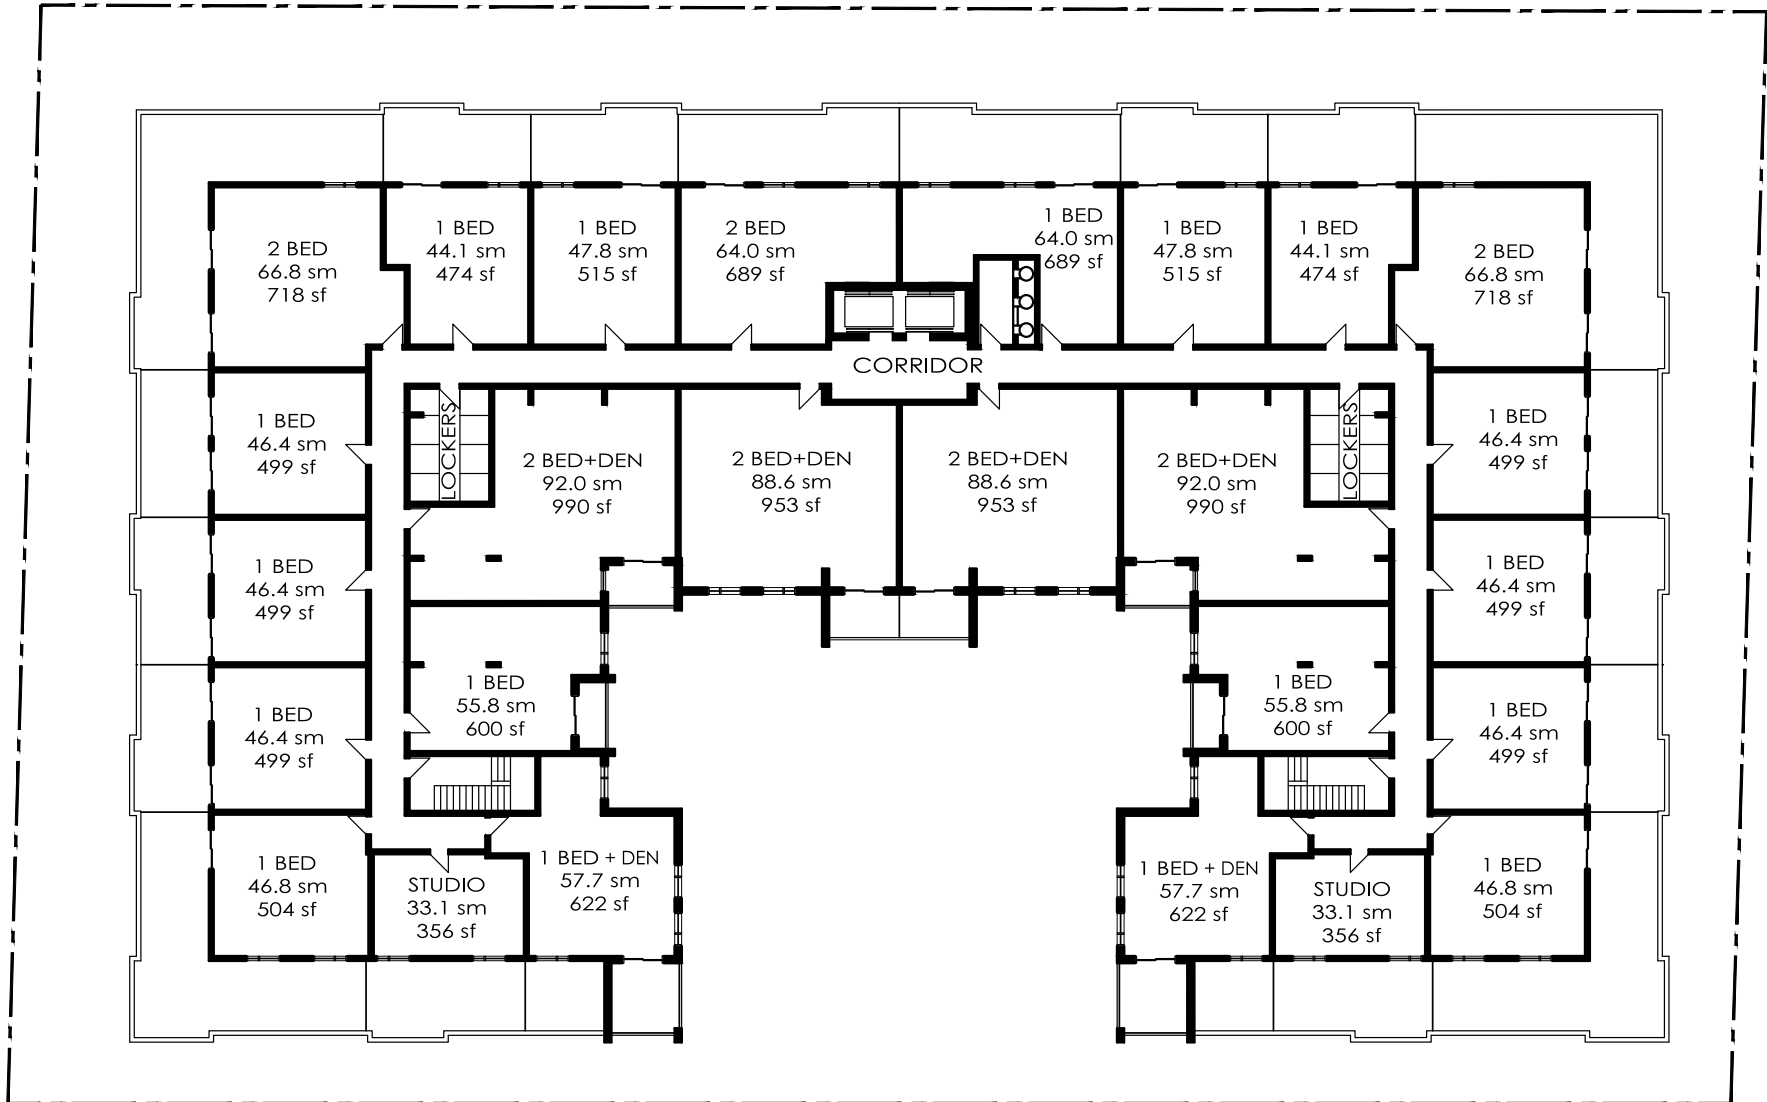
Fourth Floor Plan prepared by Lintack Architects Inc.
